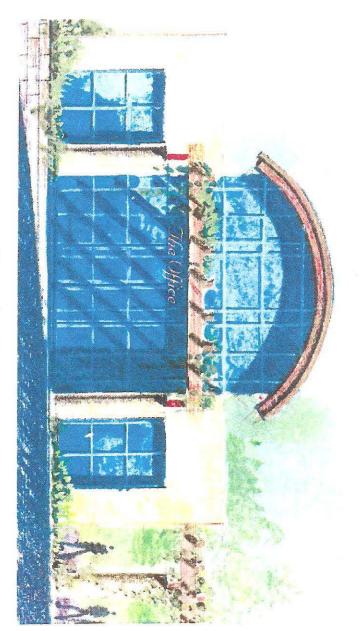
OFFICE WALL MOUNTED SIGN CONCEPT
